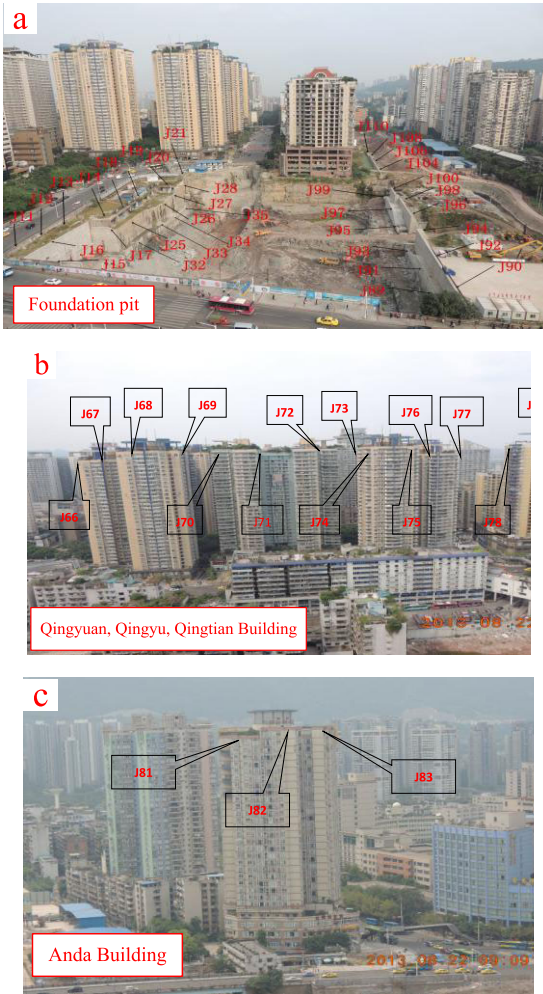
Plan view of the arrangement of displacement monitoring points.
